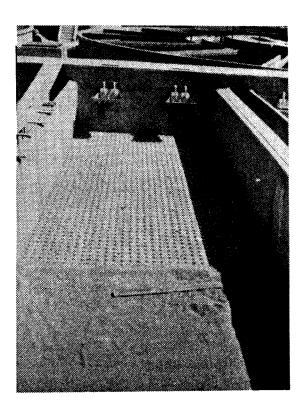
Construction of false bottom and strainer underdrainage system
